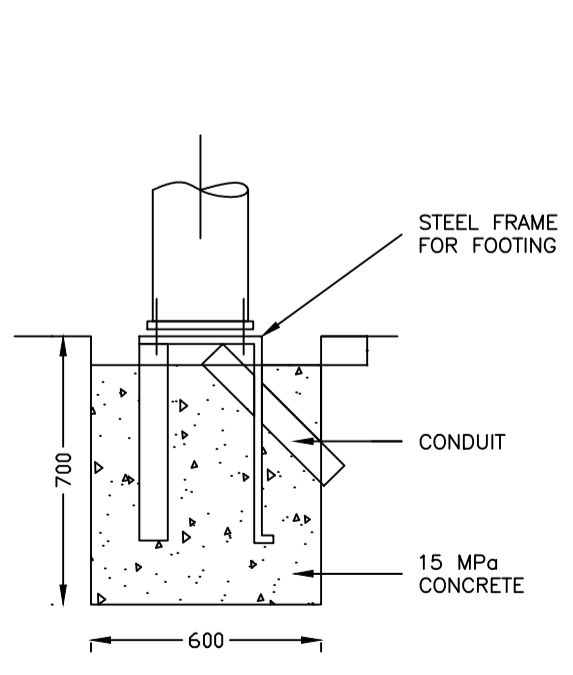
H: PLAN FOR FOOTING OF STANDARD POLE
